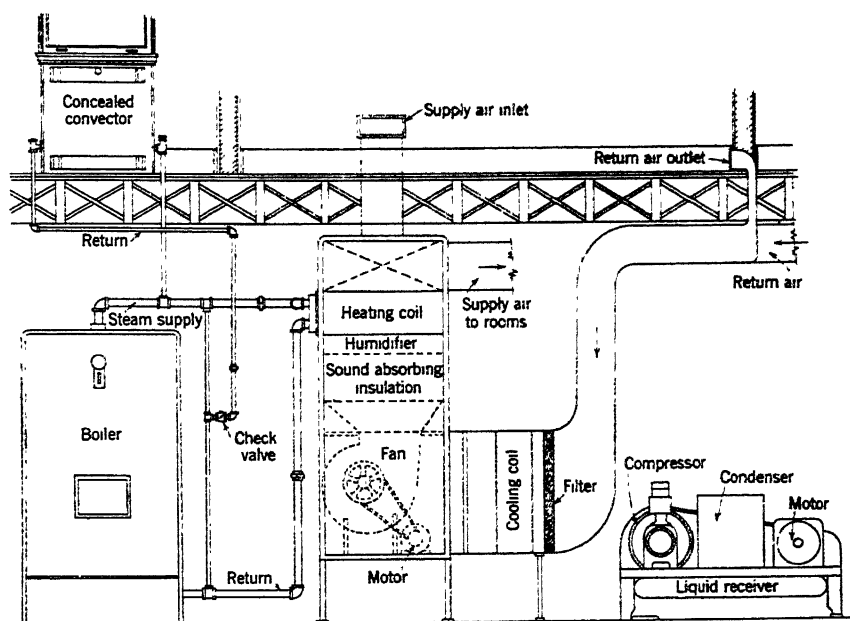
RESIDENTIAL CONDITIONING UNIT WITH STEAM BOILER
